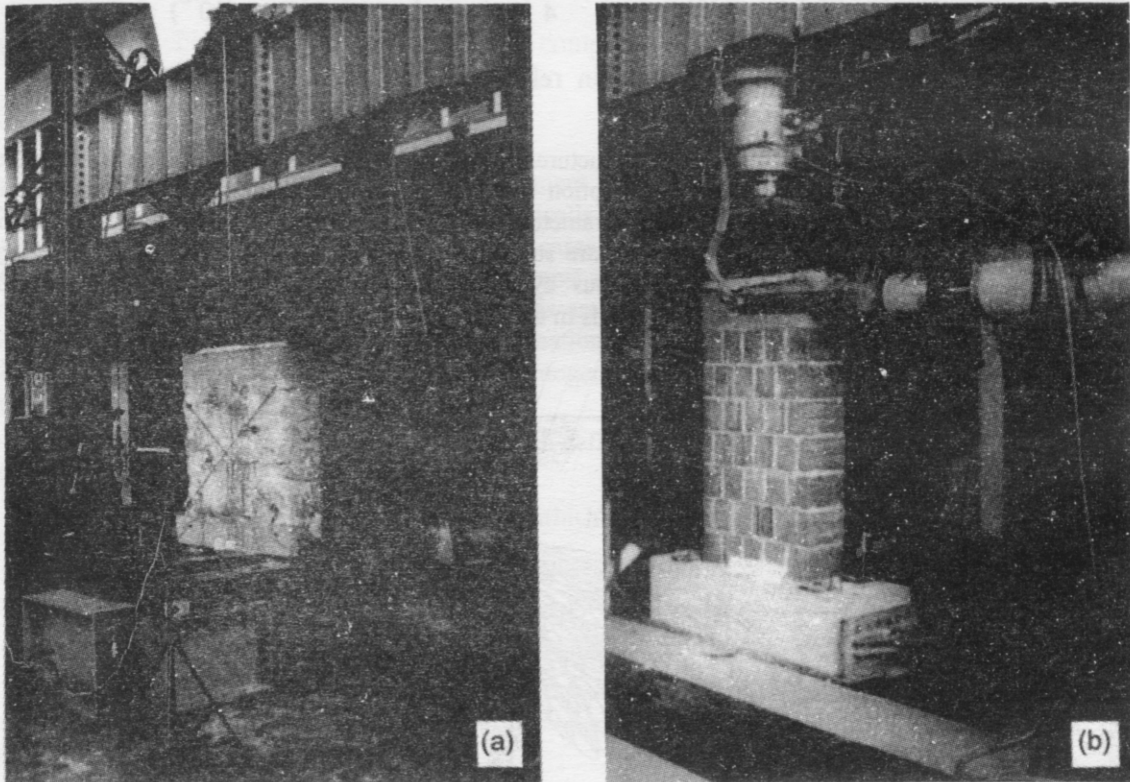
Seismic resistance tests of masonry walls: (a) fixed ended wall (b) vertical cantilever wall
